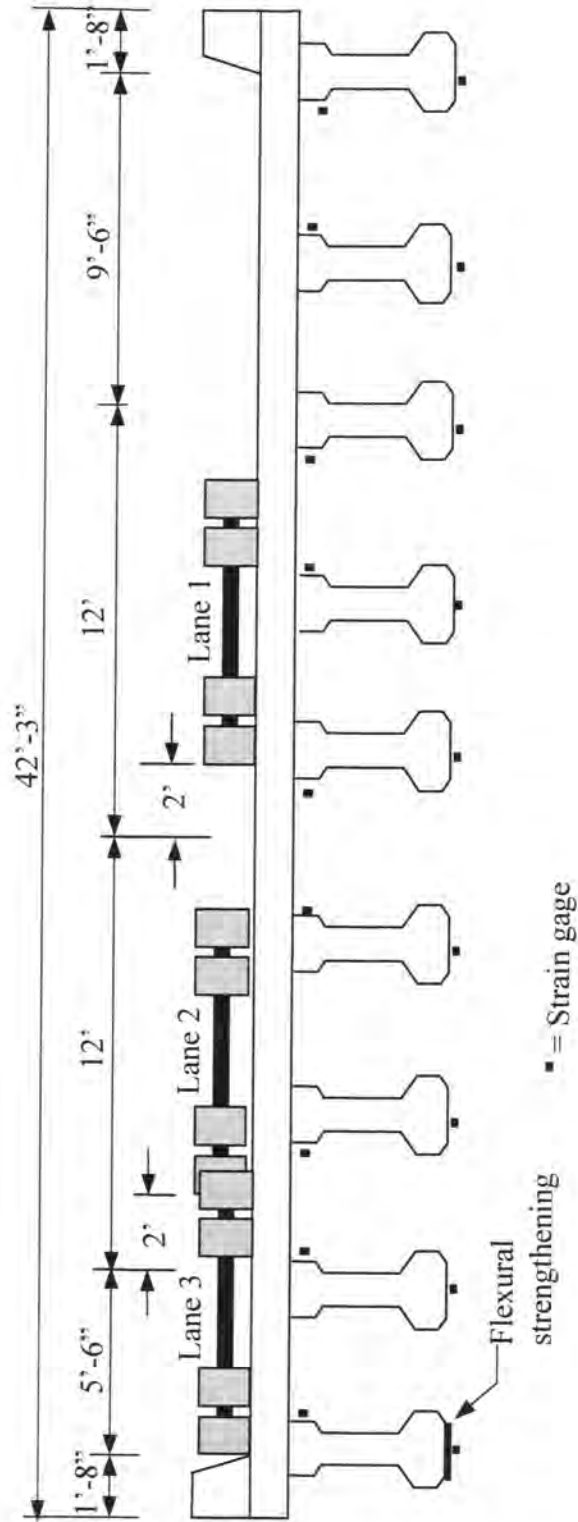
Instrumentation cross-section of the De Soto bridge.
